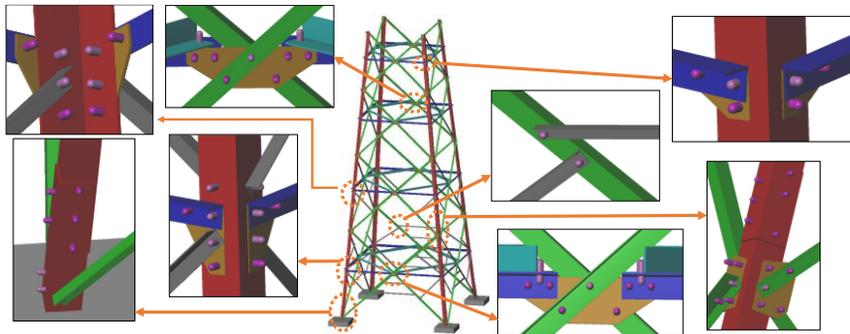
Reconstruction of steel members, bolts, and auxiliary plates of the steel tower.
